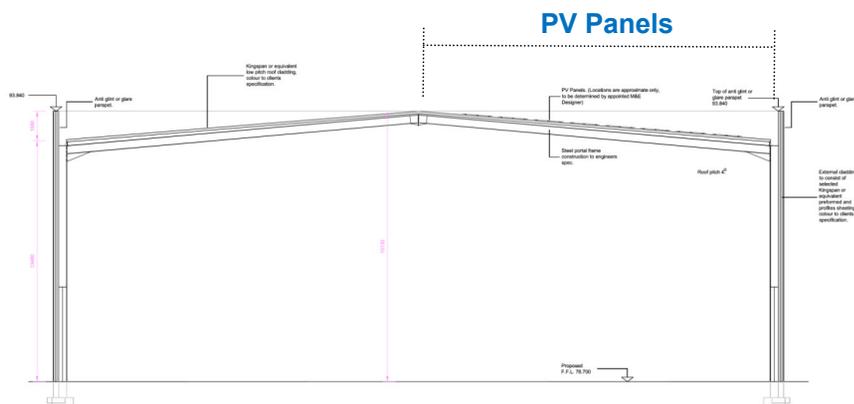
TYPICAL SECTION SHOWING INCLINATION OF PV PANELS
